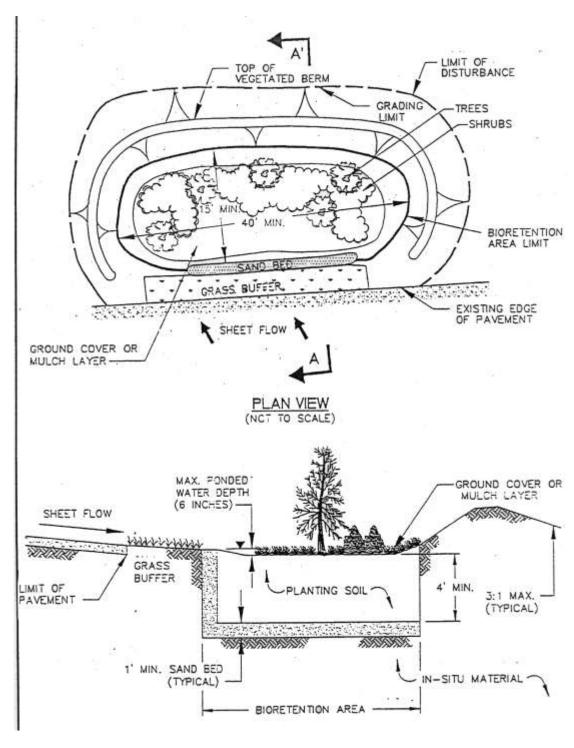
Typical Bioretention Plan and Profile Views (Cited by Barr Engineering Co., 2003; Source: Prince George's County, 1993)
